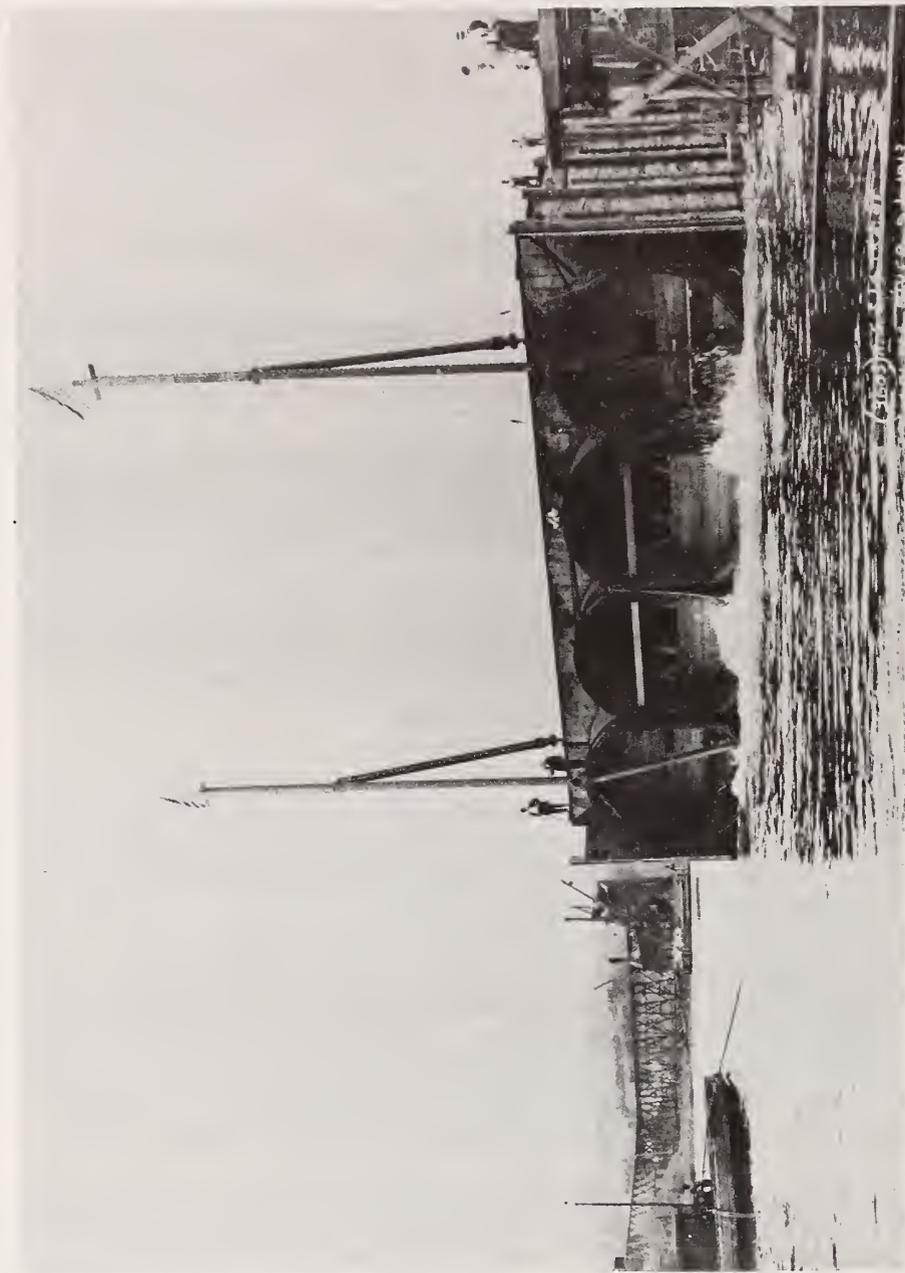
SECTION OF THE HARLEM RIVER SUNKEN TUBE TUNNEL BEING TOWED TO THE TUNNEL SITE (1913)
